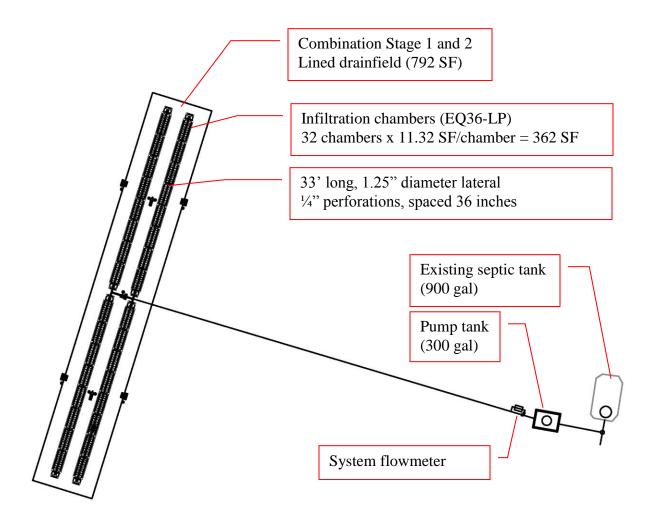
Plan view of B-HS7 PNRS layout installed in Marion county
